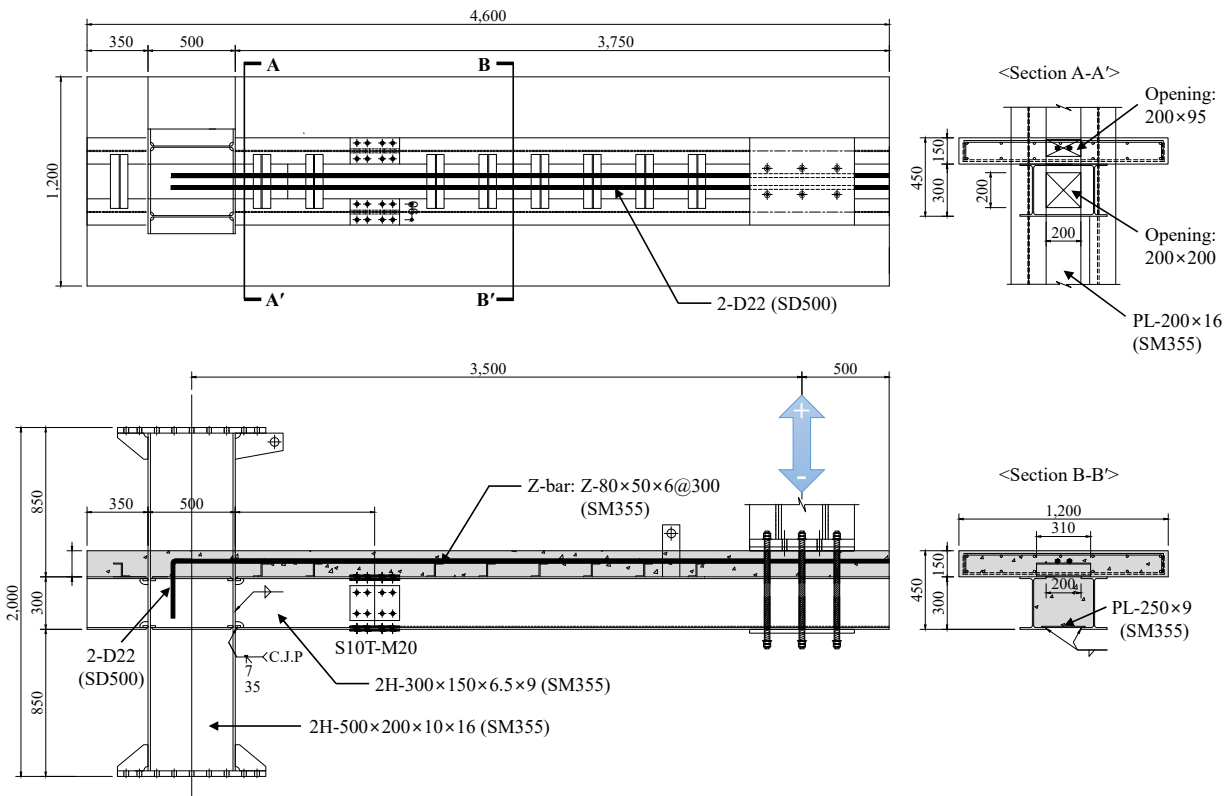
Details of 2HC beam-column joint test specimen (Unit: mm)
